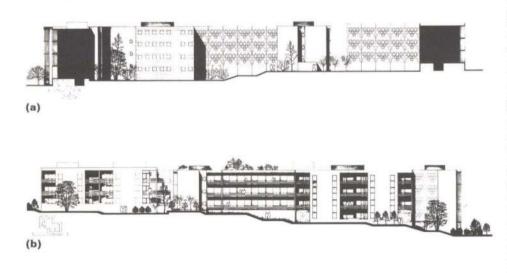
(a) Dormitories – Typical Elevation-House 3 from West (b) Dormitories – Typical Elevation-House 3 from East
